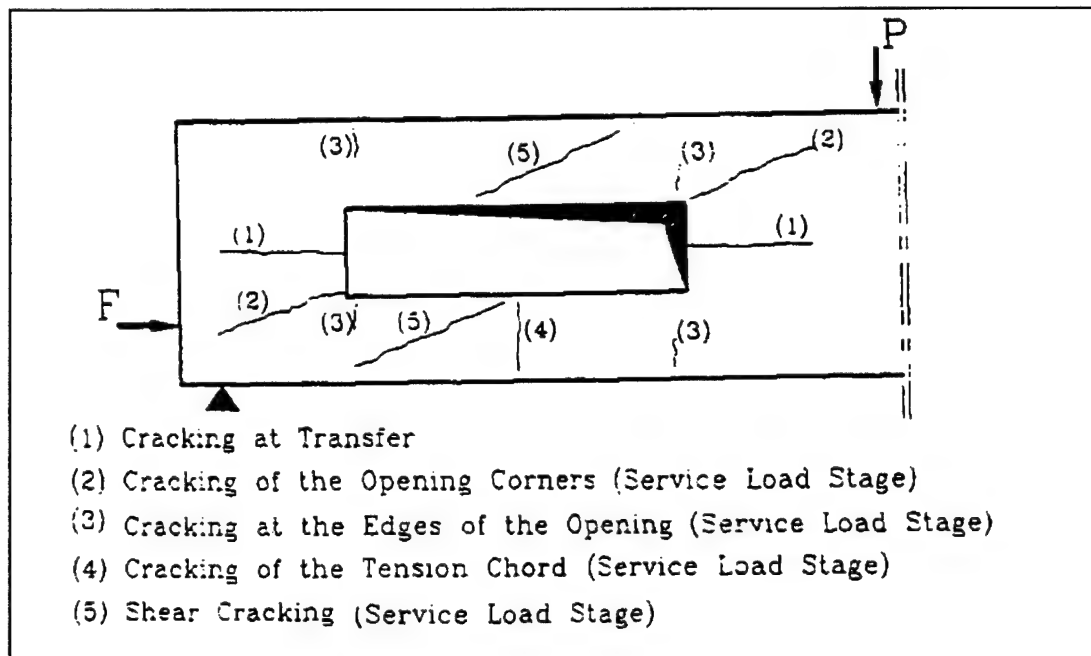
Different types of cracking around beam opening, adapted from Abdalla (1993).
